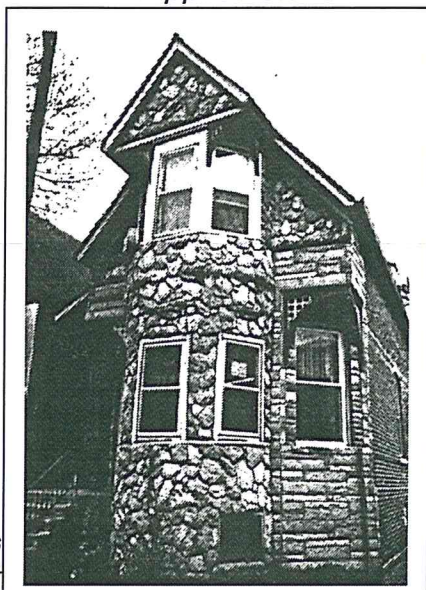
Exterior Walls – Horizontal Seam Treatment
